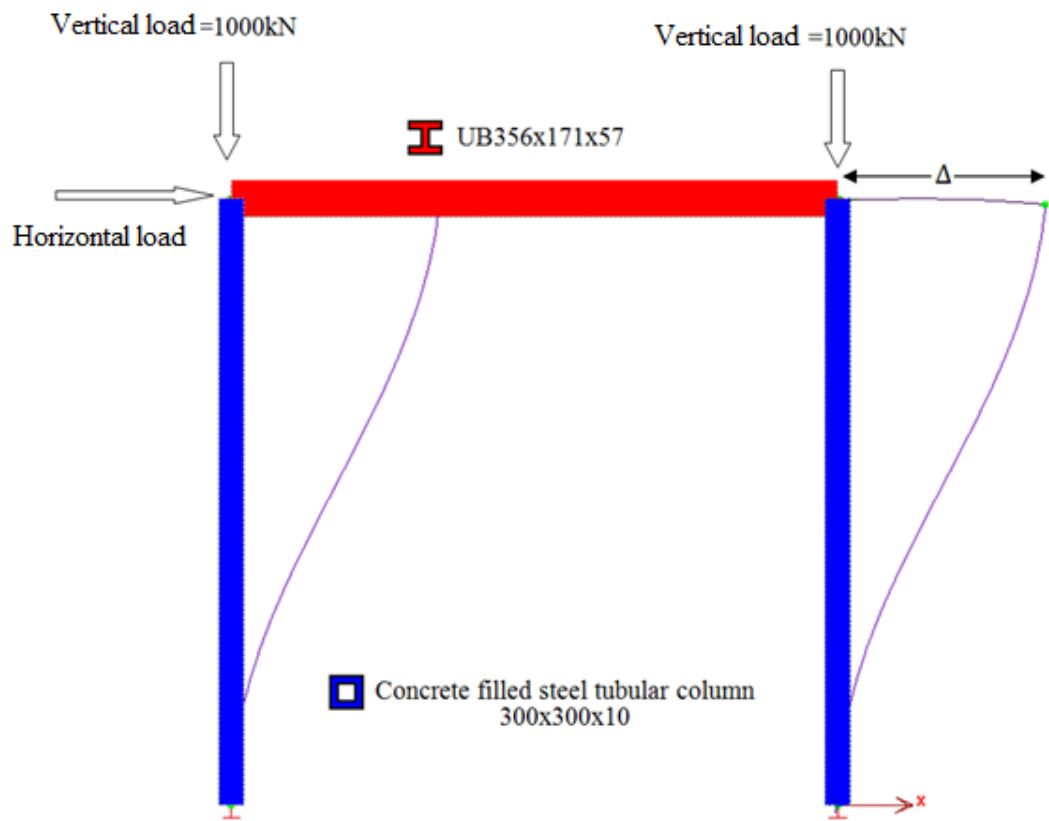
Layout and Deformed Shape of the Portal Frame
